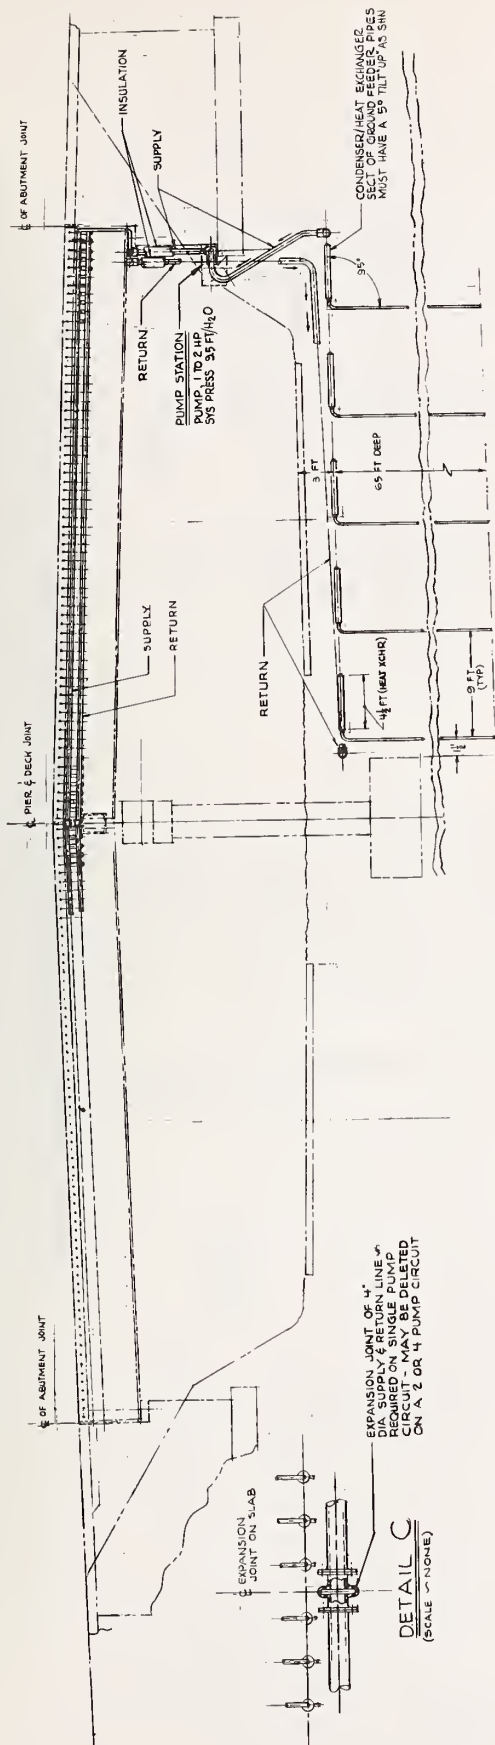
Bridge heat pipe installation (new bridge), sheet 2 of 3
